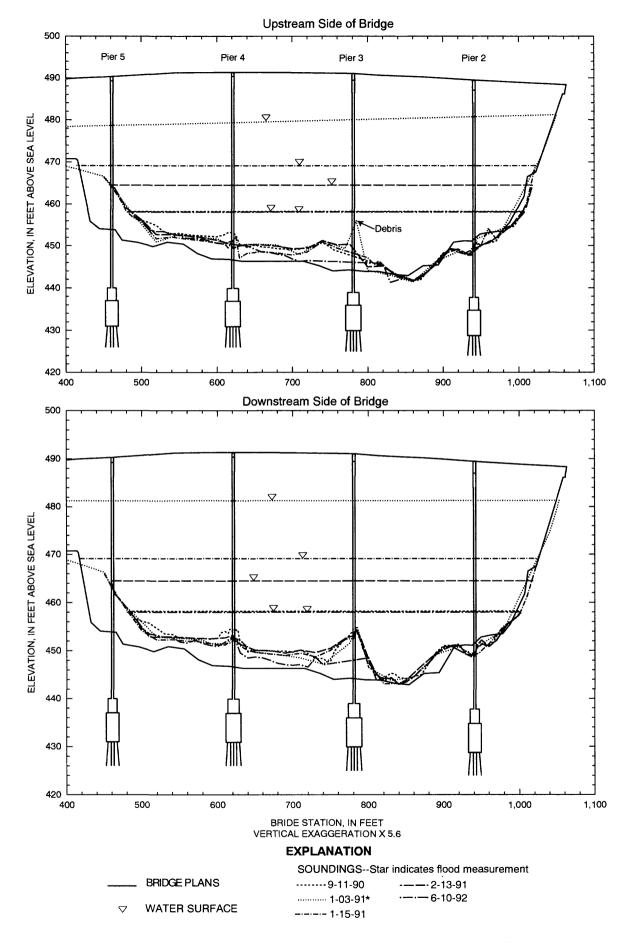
Cross sections showing bed elevations from bridge plans and soundings, State Road 163 over Wabash River at Clinton, Indiana.
